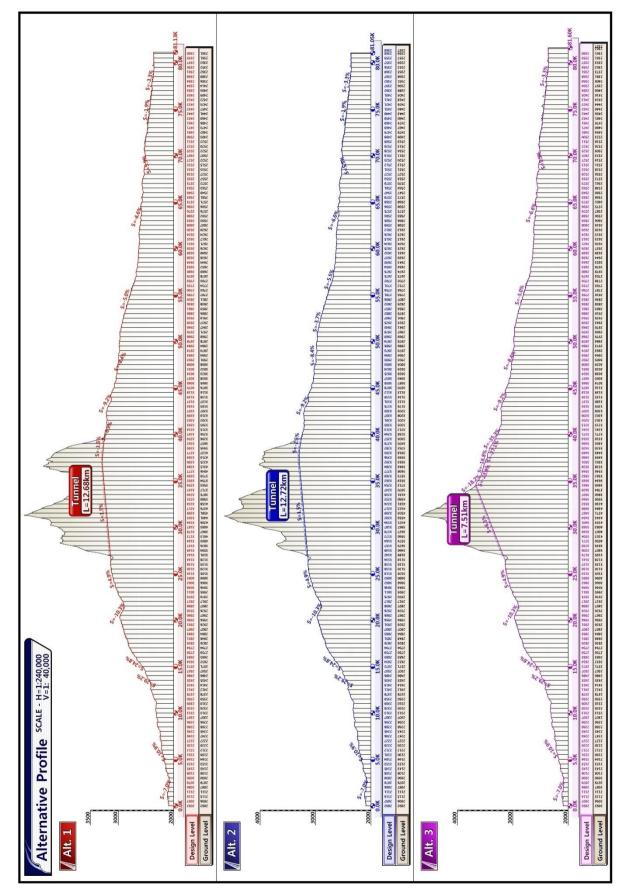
Alignment Drawings Options of Proposed Tunnel Project and Access Road
